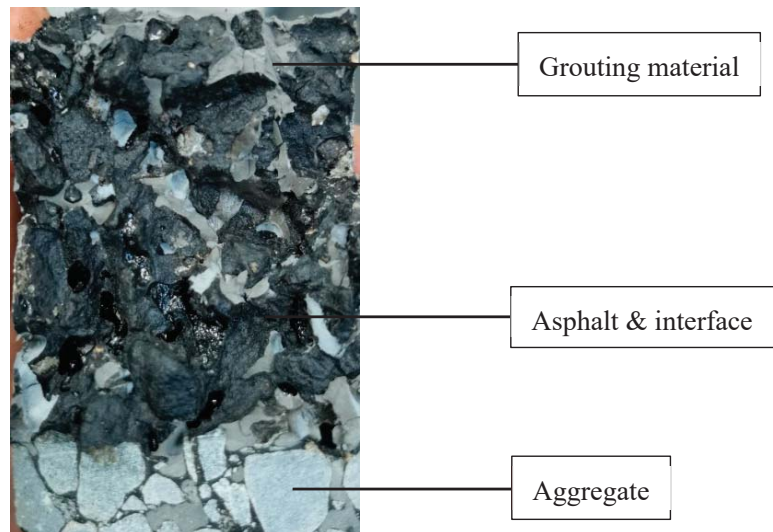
Fracture surface of the SCB fatigue test.
